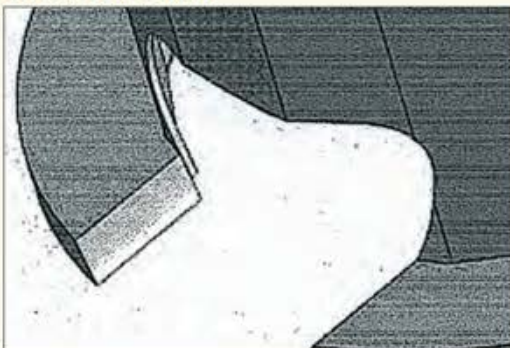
The fillet weld is in the outside-base plate/pole-wall intersection and on the bottom base-plate/pole-wall intersection.
